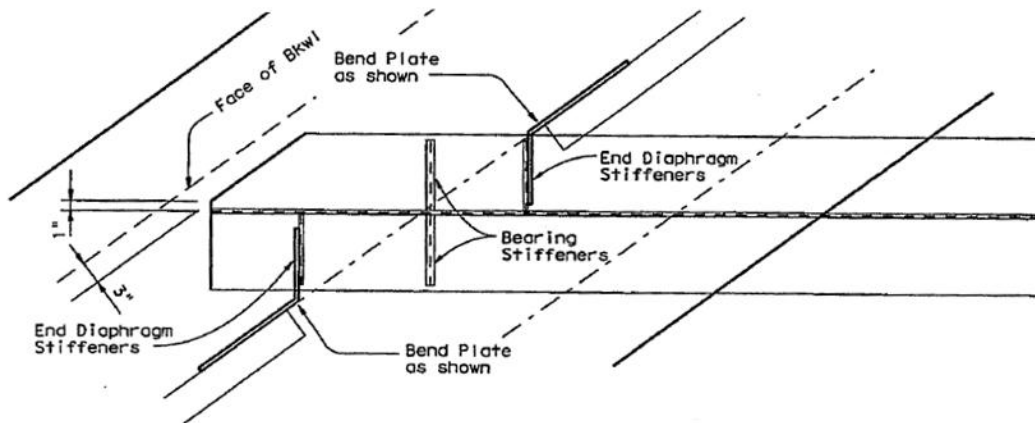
TxDOT Plan View of Bent Plate Connection
